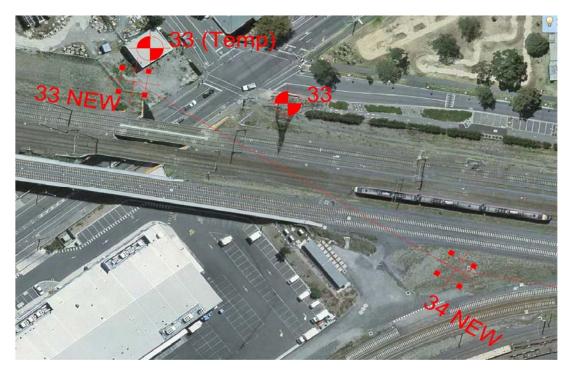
Indicative temporary transmission tower locations for Tower 33 and new Tower 34
